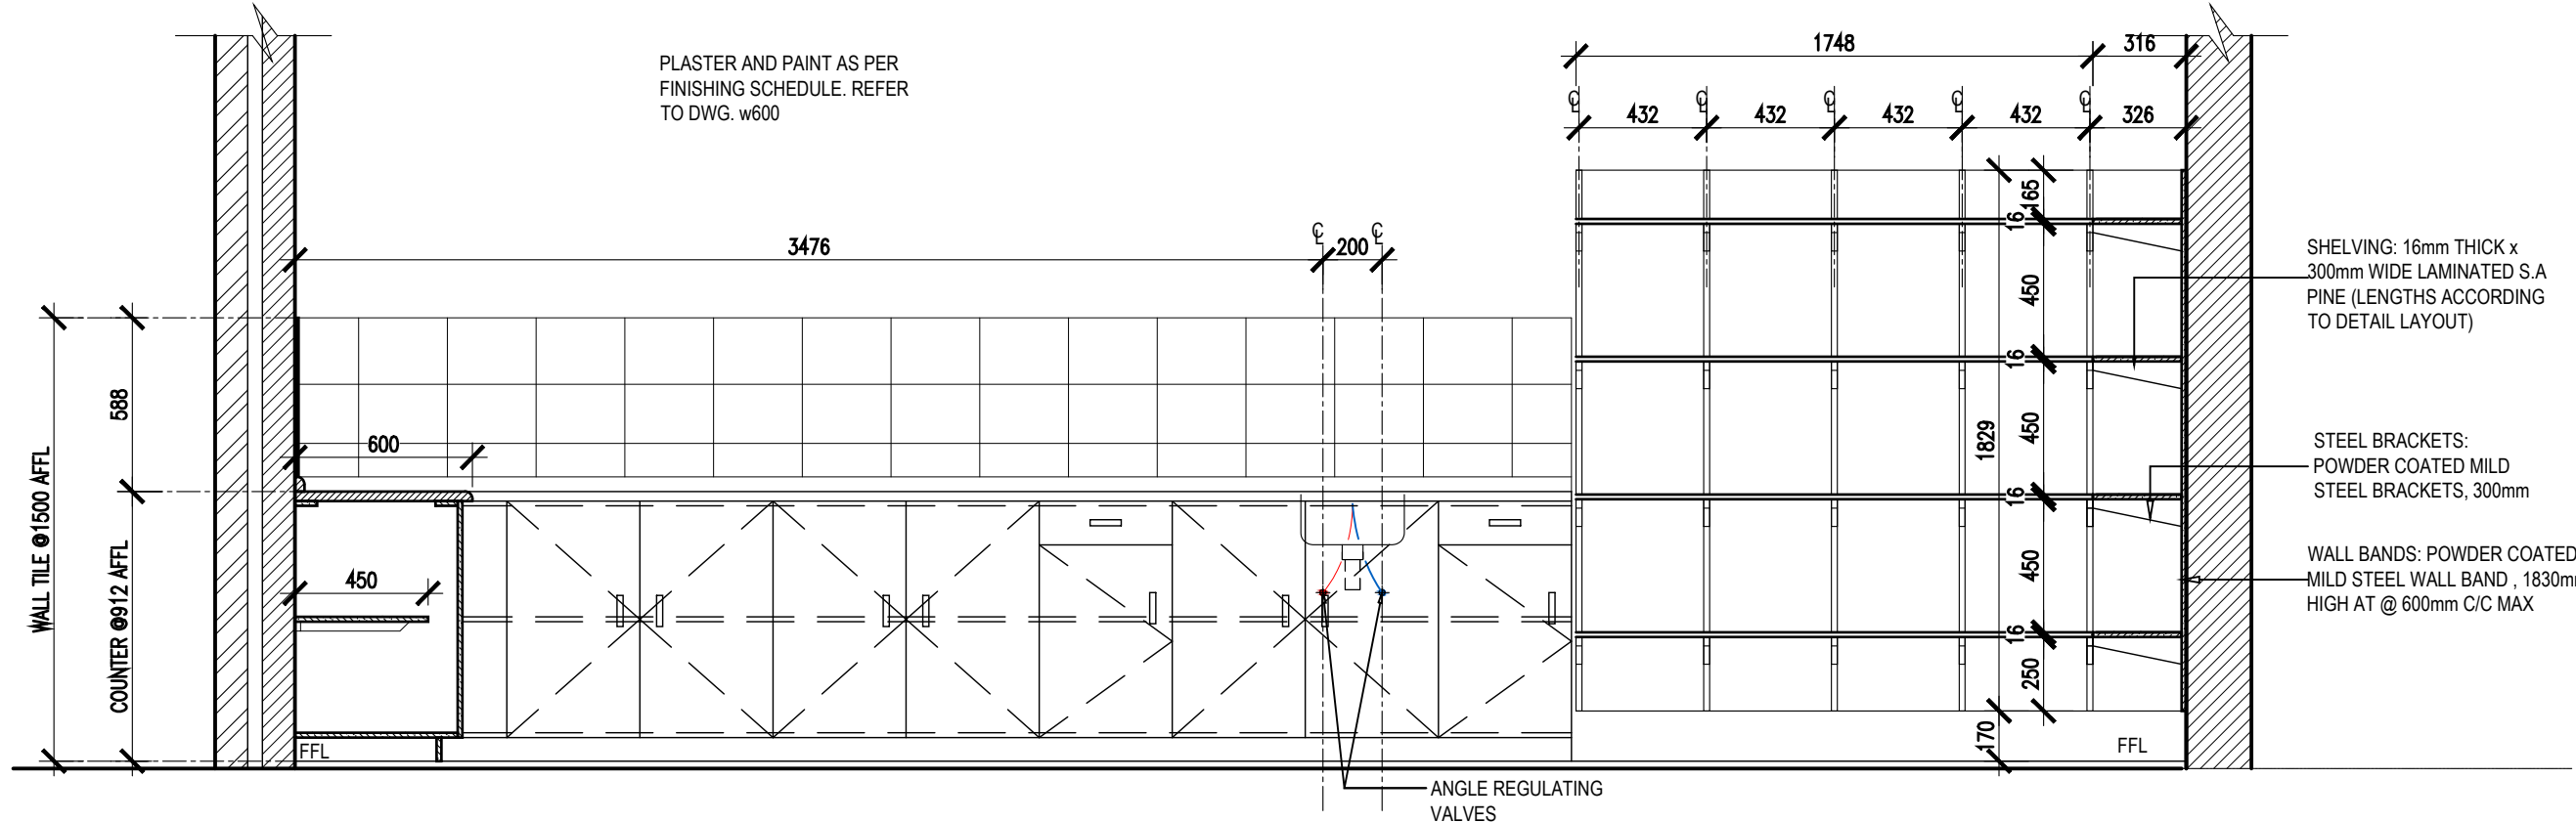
SECTIONAL ELEVATION B SCALE 1:25
